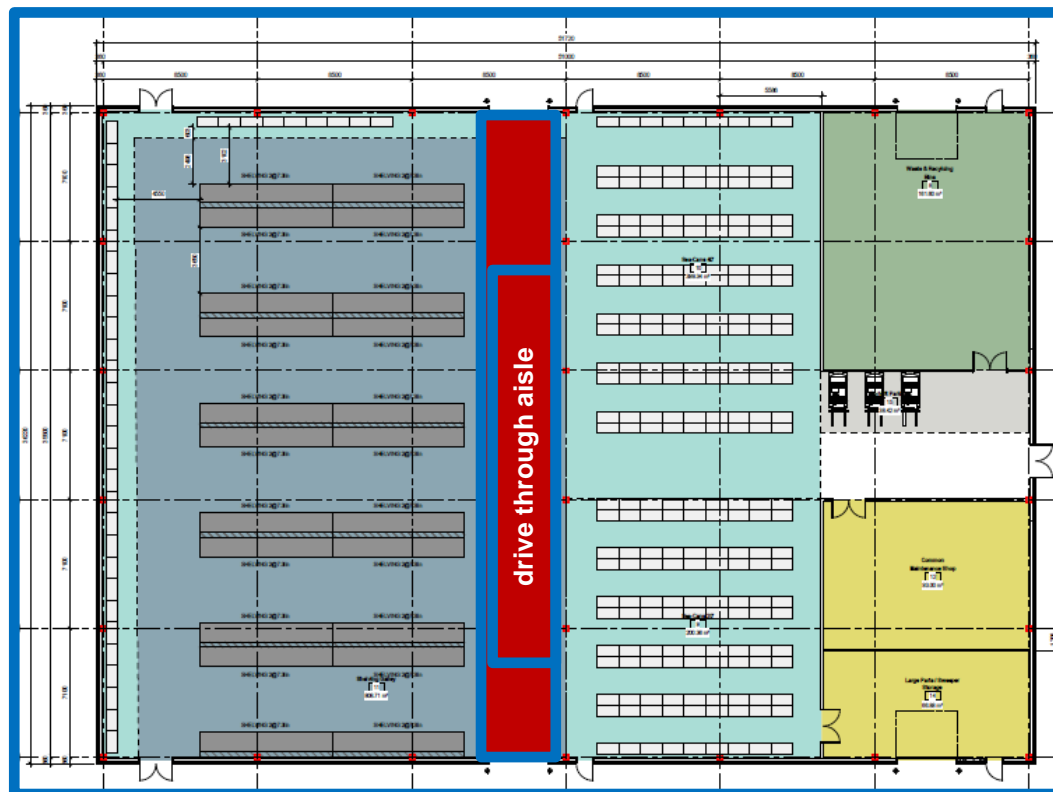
Floor Plan of Purpose-Built Storage Building with drive through aisle
